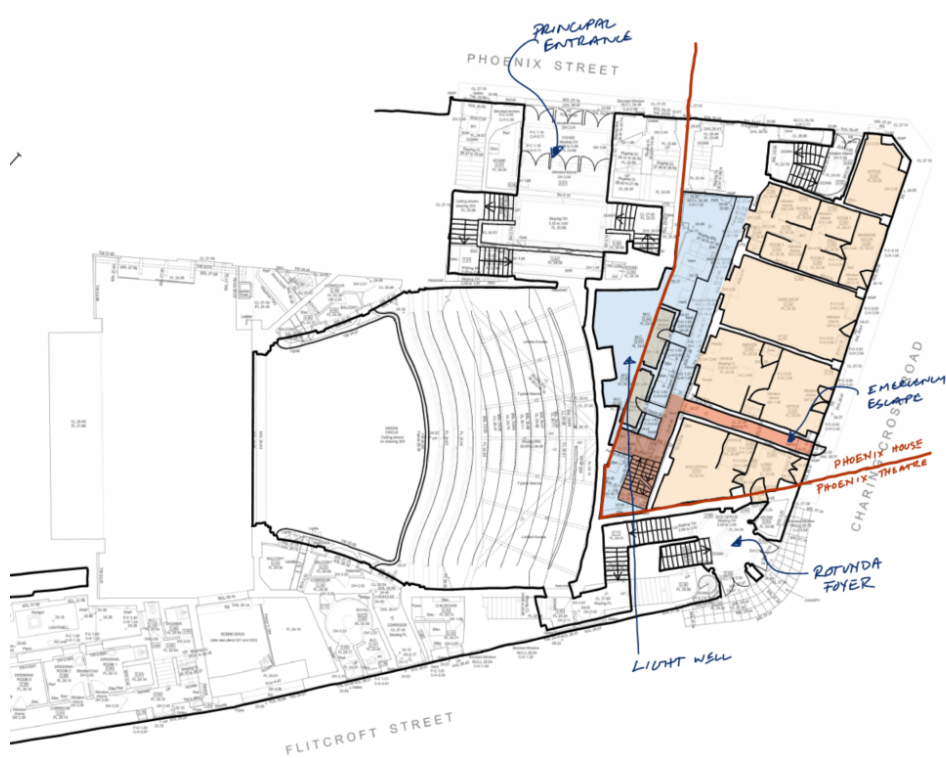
(above): Existing ground floor plan showing the existing entrances into the Phoenix Theatre
